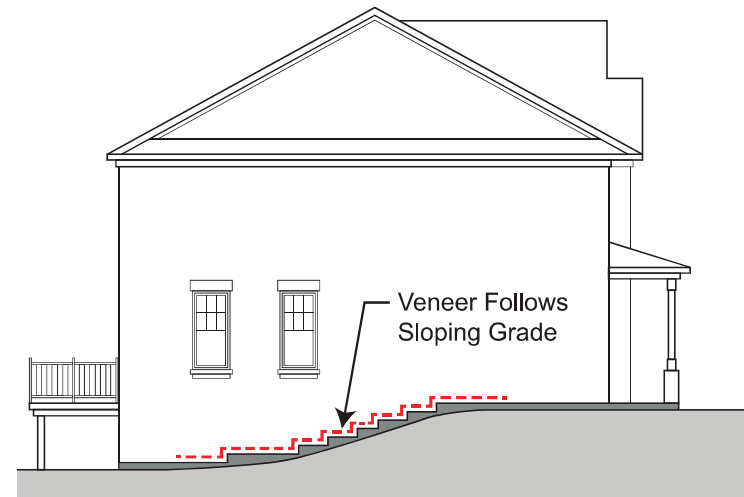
Veneer should be stepped to follow sloping grade to limit exposure of the foundation wall
